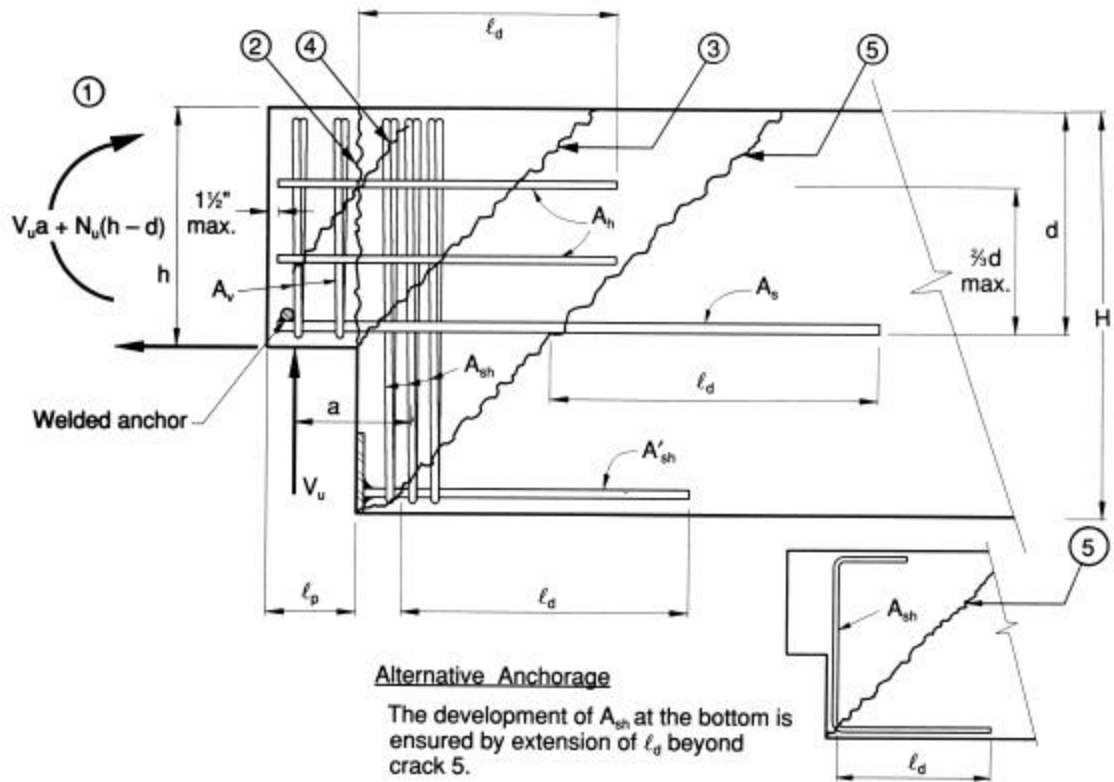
Potential Failure Modes and Required Reinforcement in Dapped-end Connections
